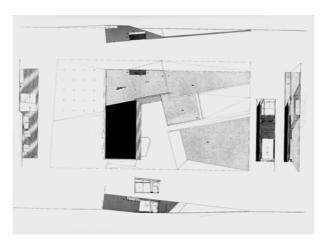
Villa Wilbrink, Amersfoort, 1992-1994, Roof Plan
